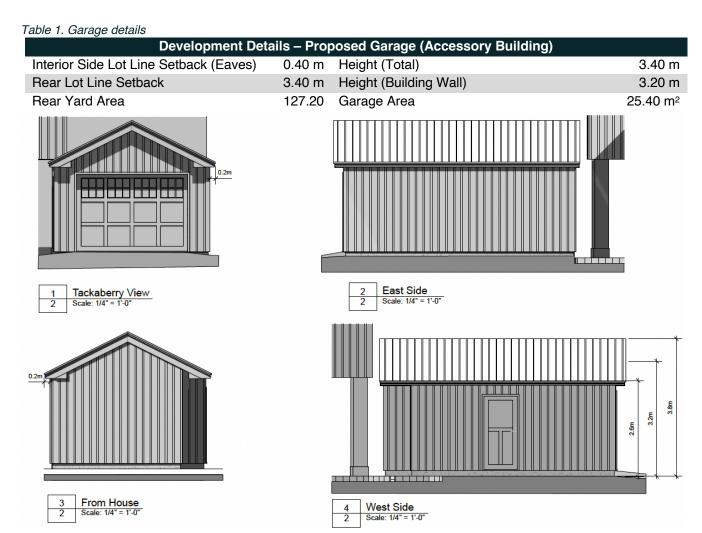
Proposed garage elevations prepared by e.jane wilson architect
